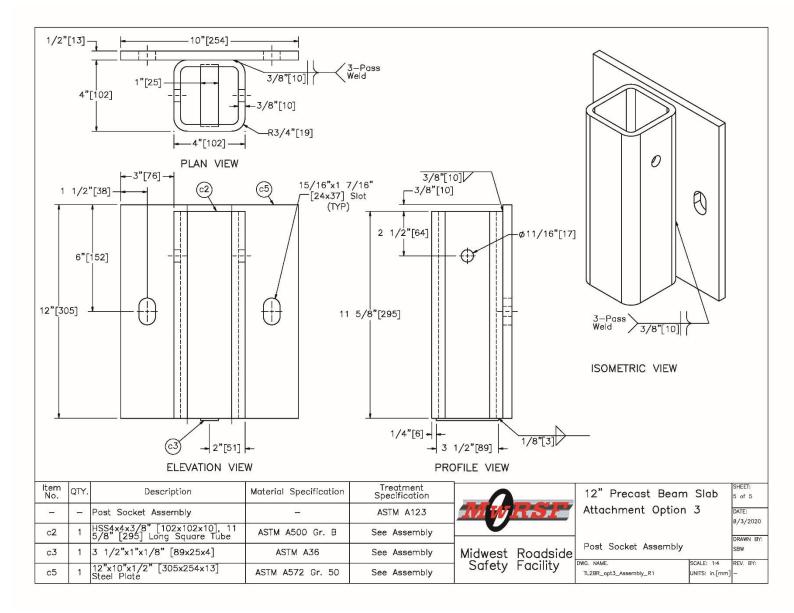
System Details, TL-2 Bridge Rail Attachment to 12-in. Deck, Option 3, Socket Assembly
